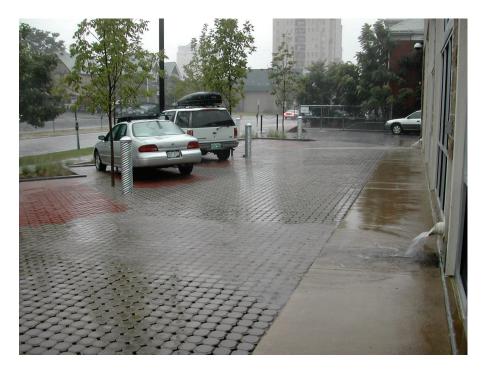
(K) Pervious pavers or unit pavers replace impervious surfaces and allow stormwater to soak into the ground. They typically are made out of precast concrete, brick, stone, or cobbles and form interlocking patterns with the gaps filled with either sand or gravel. (Photograph courtesy of Holly Piza)
